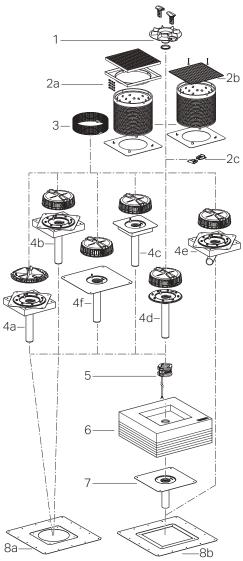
Overview of all usable components of the prefabricated Geberit Pluvia roof outlets
